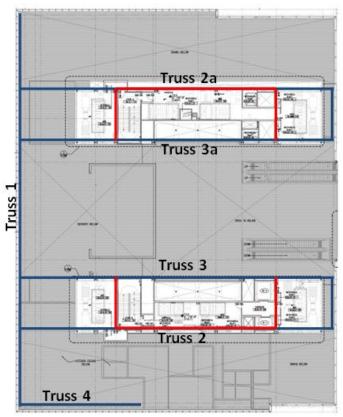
Truss Nomenclature (Note: Truss 2a and Truss 3a designs are identical to Truss 2 and Truss 3, but have different cambers to control deflections.)
